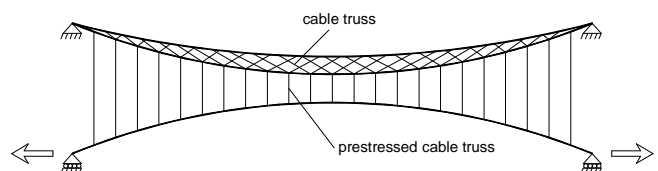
Suspended cable structure stabilization using prestressed cable truss instead of top chord cable
